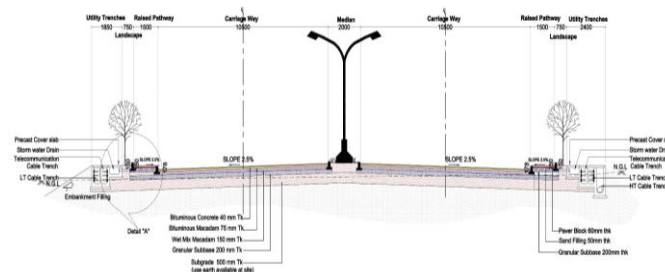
Prototype of main access road with 21M width with trenches for High tension and Low tension cables with telecommunication trench and trench for storm water drain collected from the roads provided with 2.5% slope to the raised pathway.
